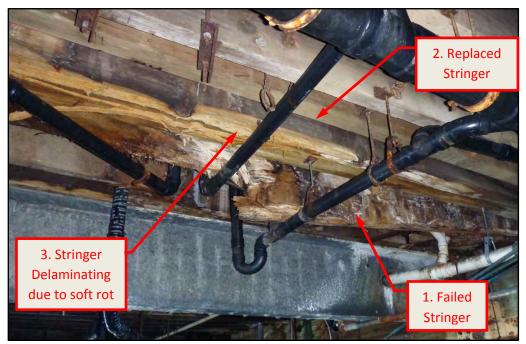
A failed stringer (1) has been replaced with a newer stringer (2). Damage due to soft rot is seen on an adjacent stringer (3).
